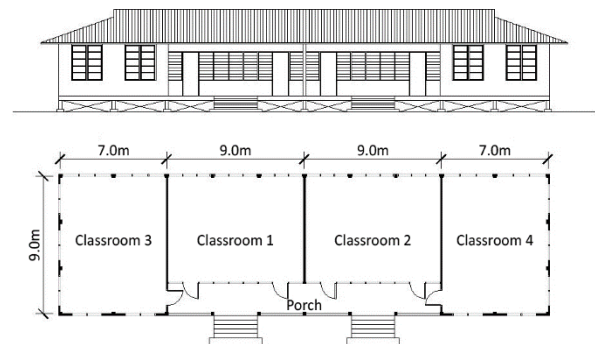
Typical floorplan and elevation of a Gabaldon Schoolhouse based on surviving drawings
